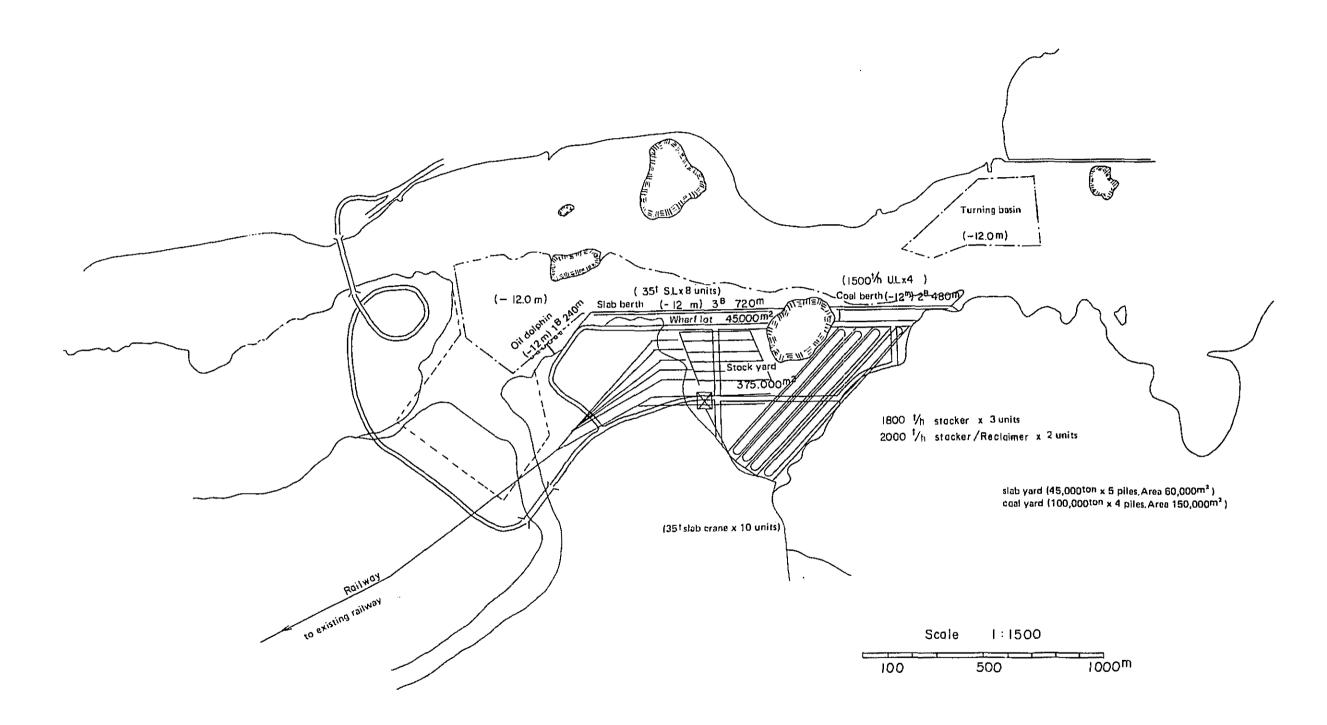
Facility plan of the port of Vitória (Alternative)
